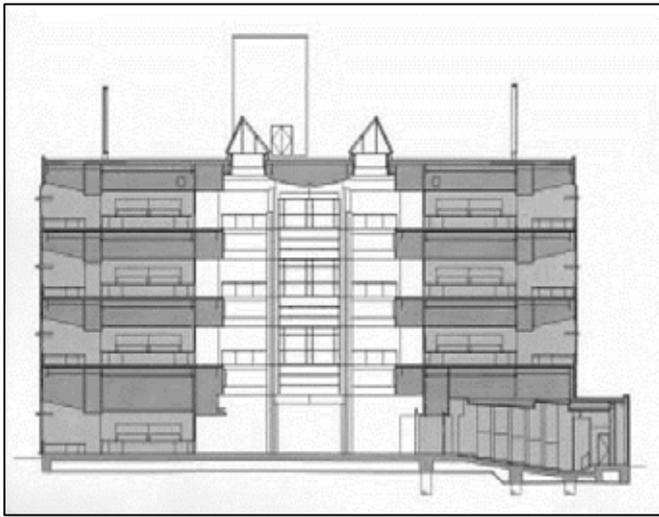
shows the building section showing the interior atria, which provide daylighting (Source: Flad & Associates, Architect).
